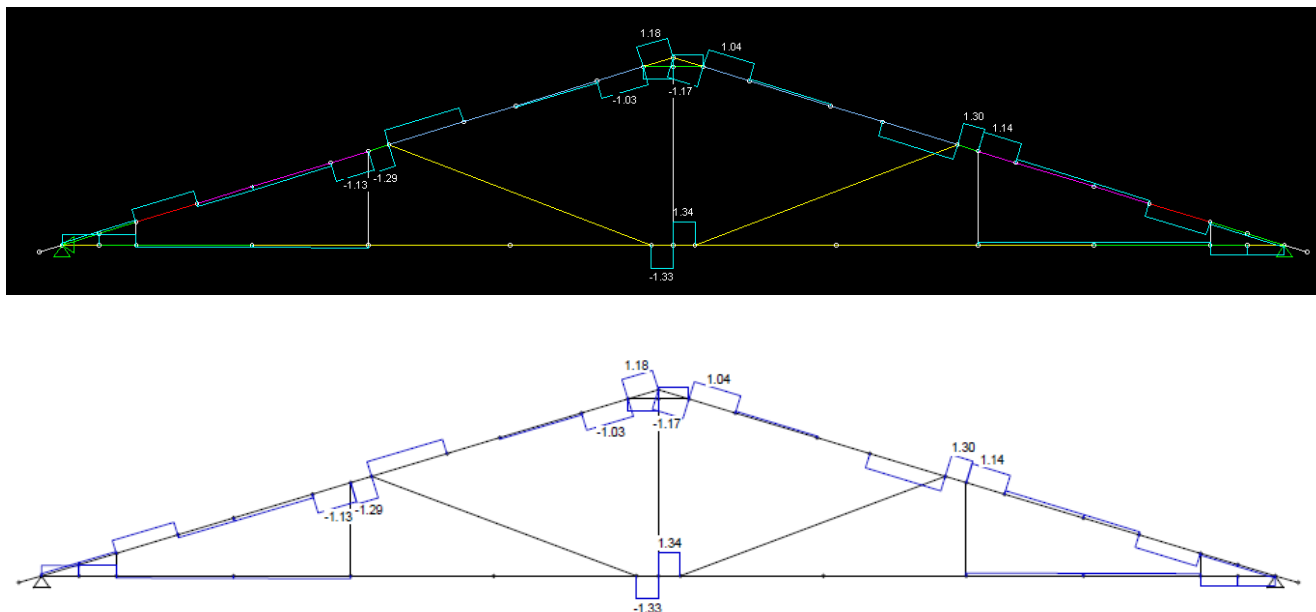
Load diagram of Truss Design Capacity with roof battens at 400mm spacing
